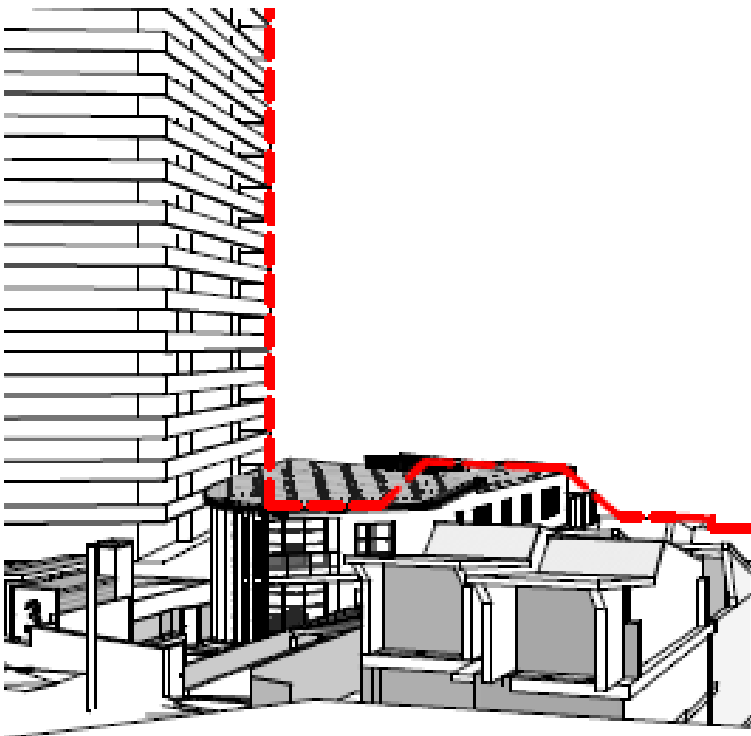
Plan Extract: Level 3 balcony view from 8-10 Lauderdale Avenue.
